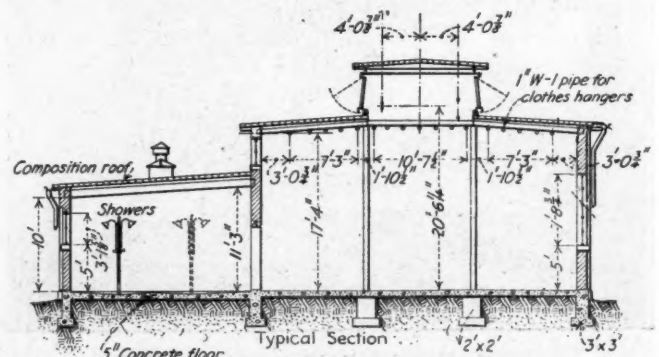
CROSS-SECTIONAL ELEVATION OF BATHHOUSE
